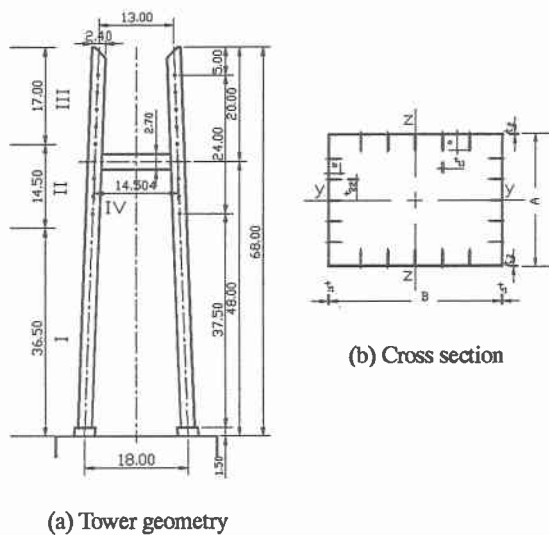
Steel tower of Iwamizawa cable-stayed bridge
